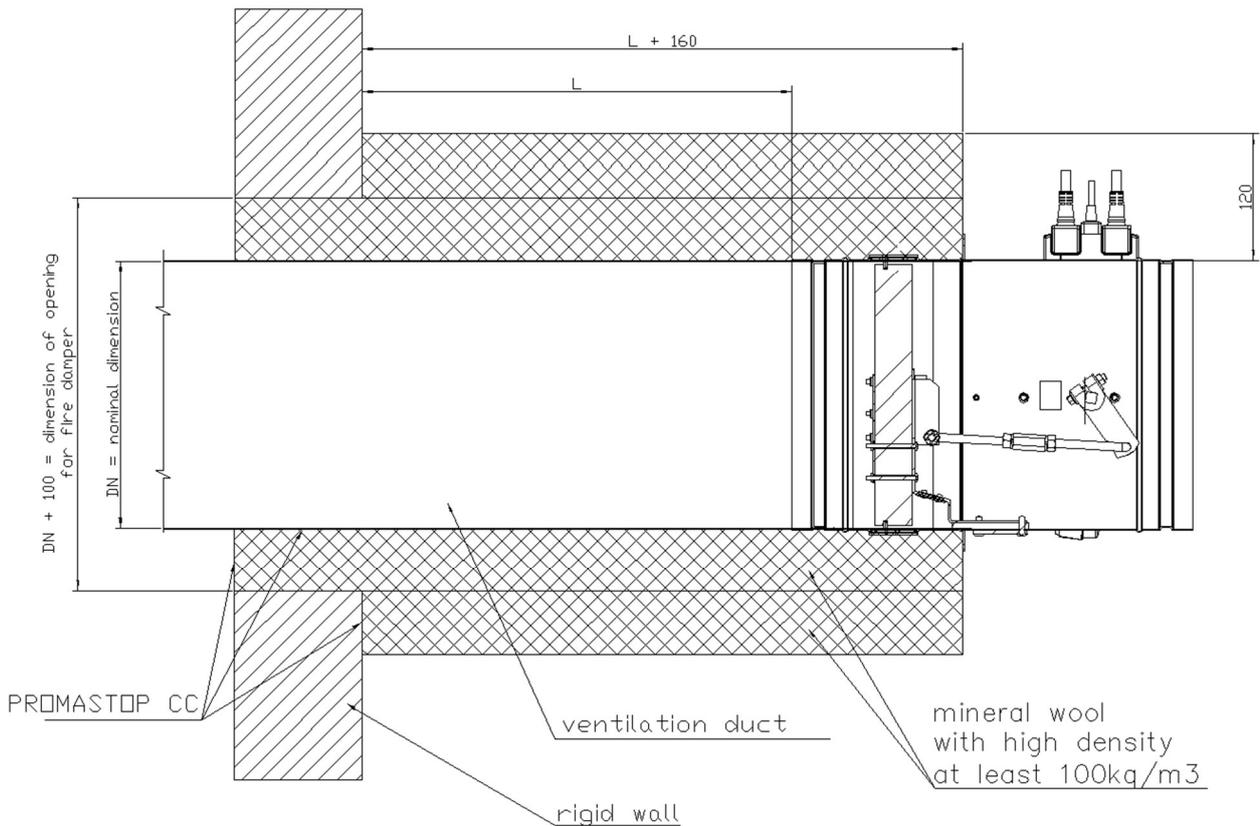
Installation method of fire dampers KTS-O away from wall constructions
